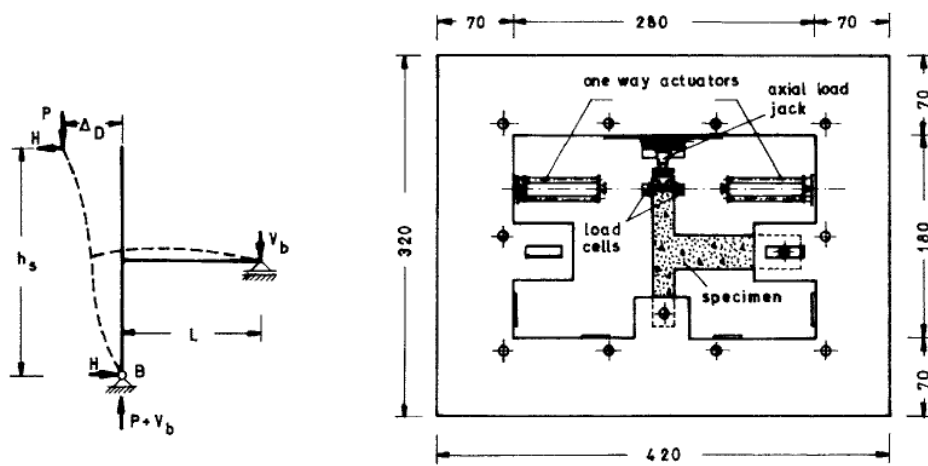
Test setup for exterior beam-column connection (Tsonos, 1999)
